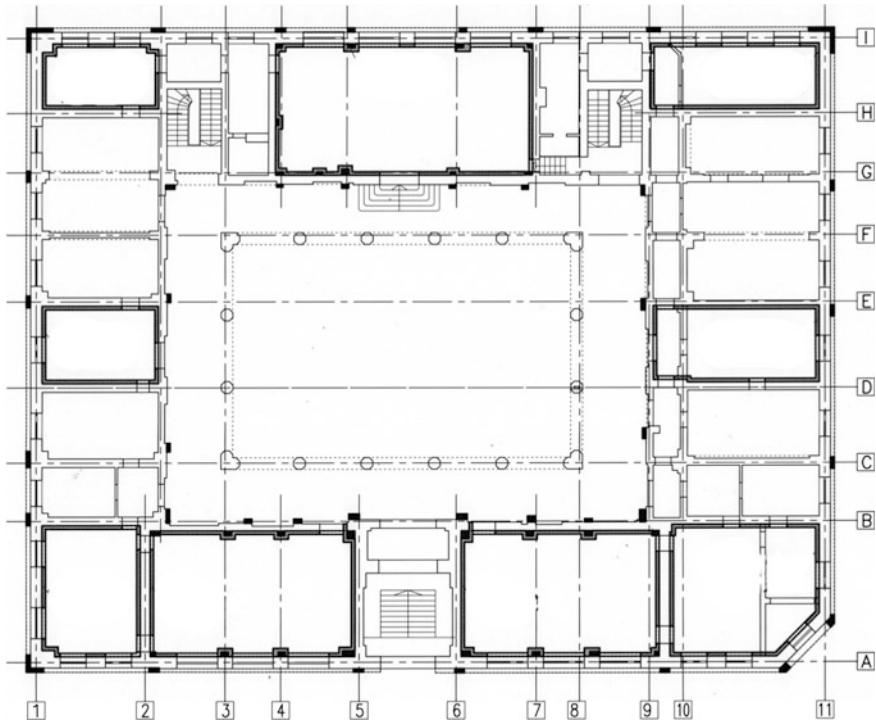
Floor plan of the former Foçşani courthouse, highlighting the older structural interventions as well as the newer ones proposed in the strengthening project
